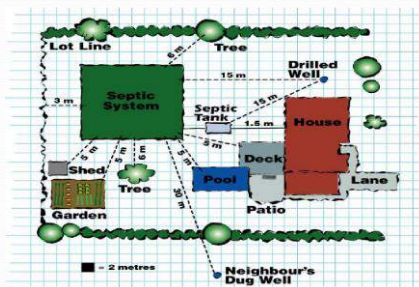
Well too close to septic tank – well/trank should be at least 15 metres (50 feet) apart
